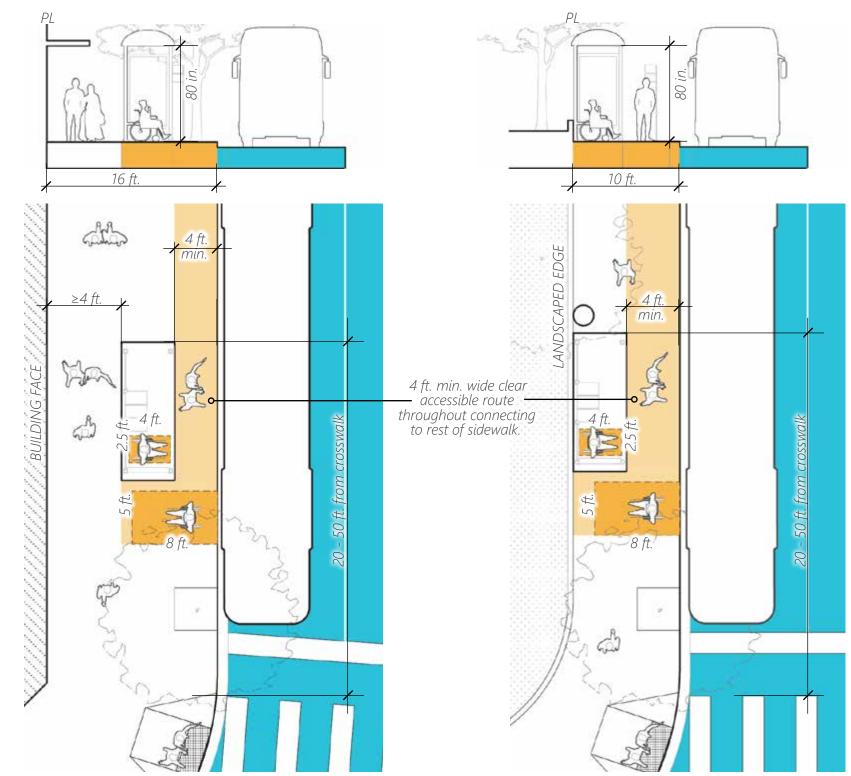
Near Side, Pull-Out Loading Bus Stop at a 16 ft. Wide Sidewalk along a Retail Street.
